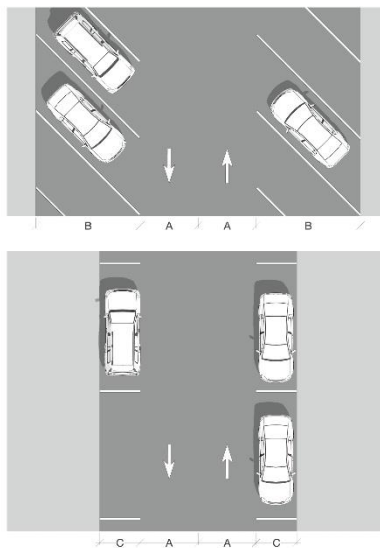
Illustrated Parking Lane and Travel Lane Standards
